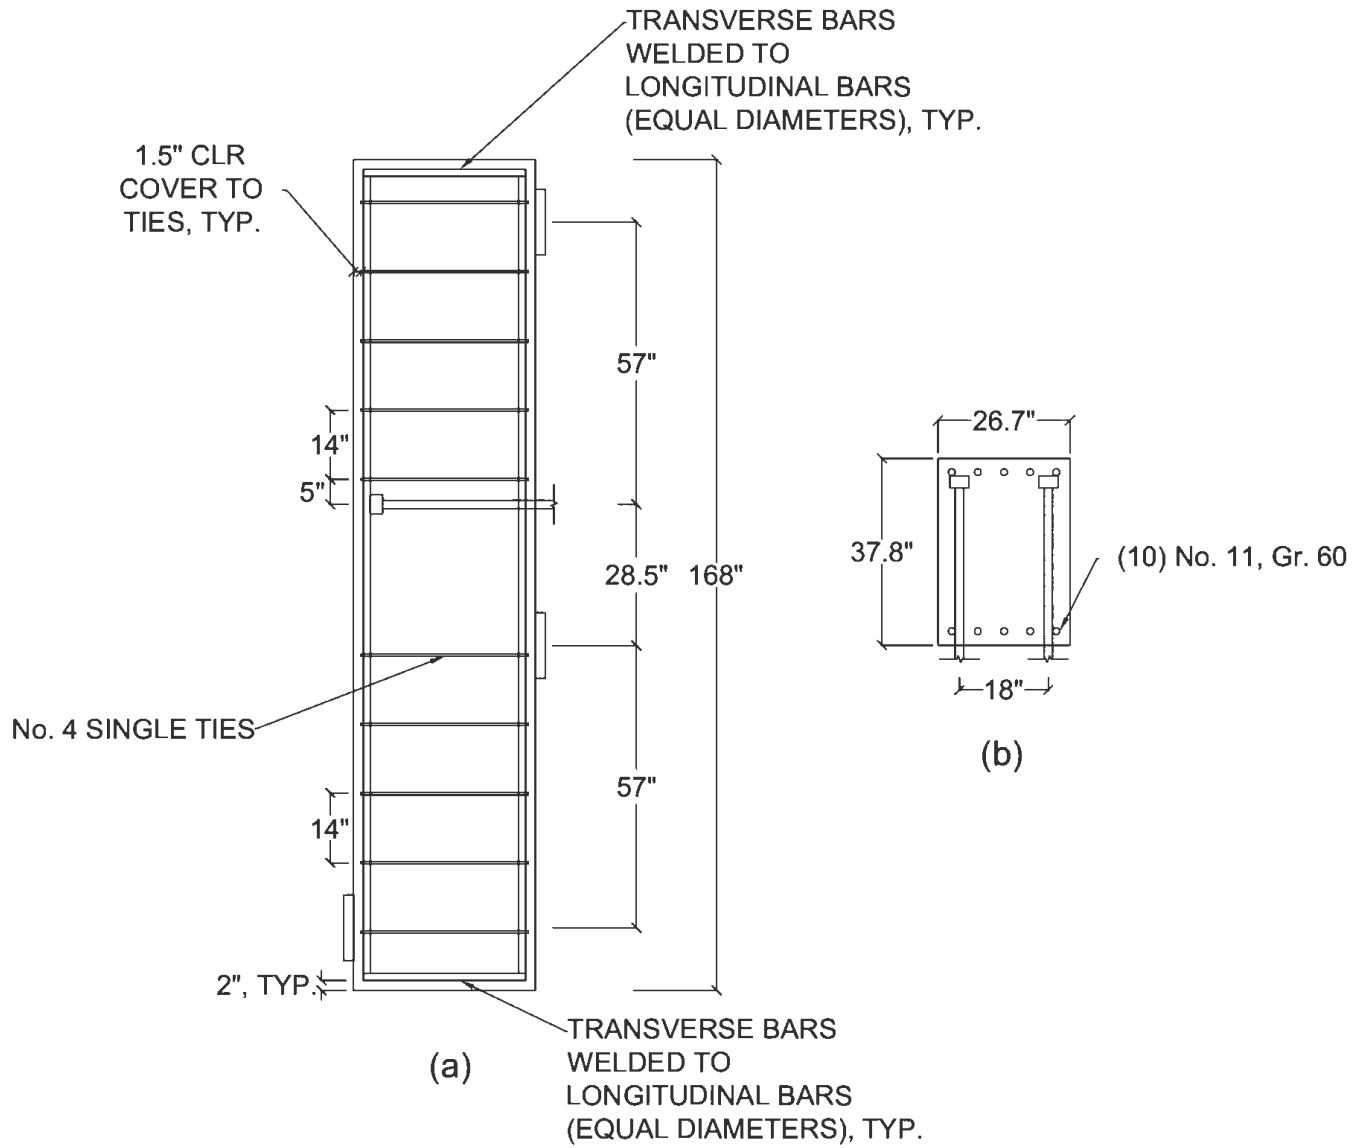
Details of reinforcement layout for No. 14 headed bar specimen 14-3: (a) elevation, (b) cross-section
